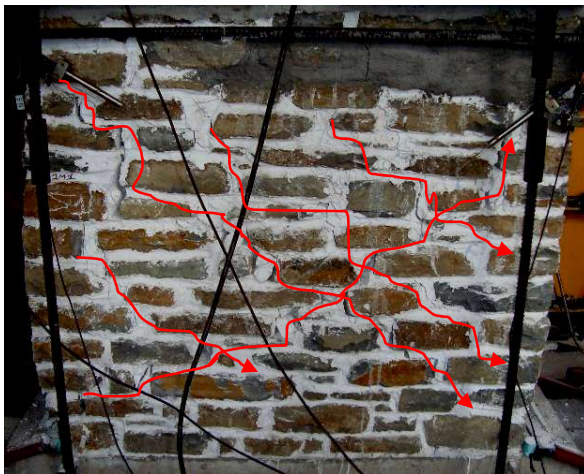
Diagonal cracks that developed in the stone masonry specimen S1M1.
